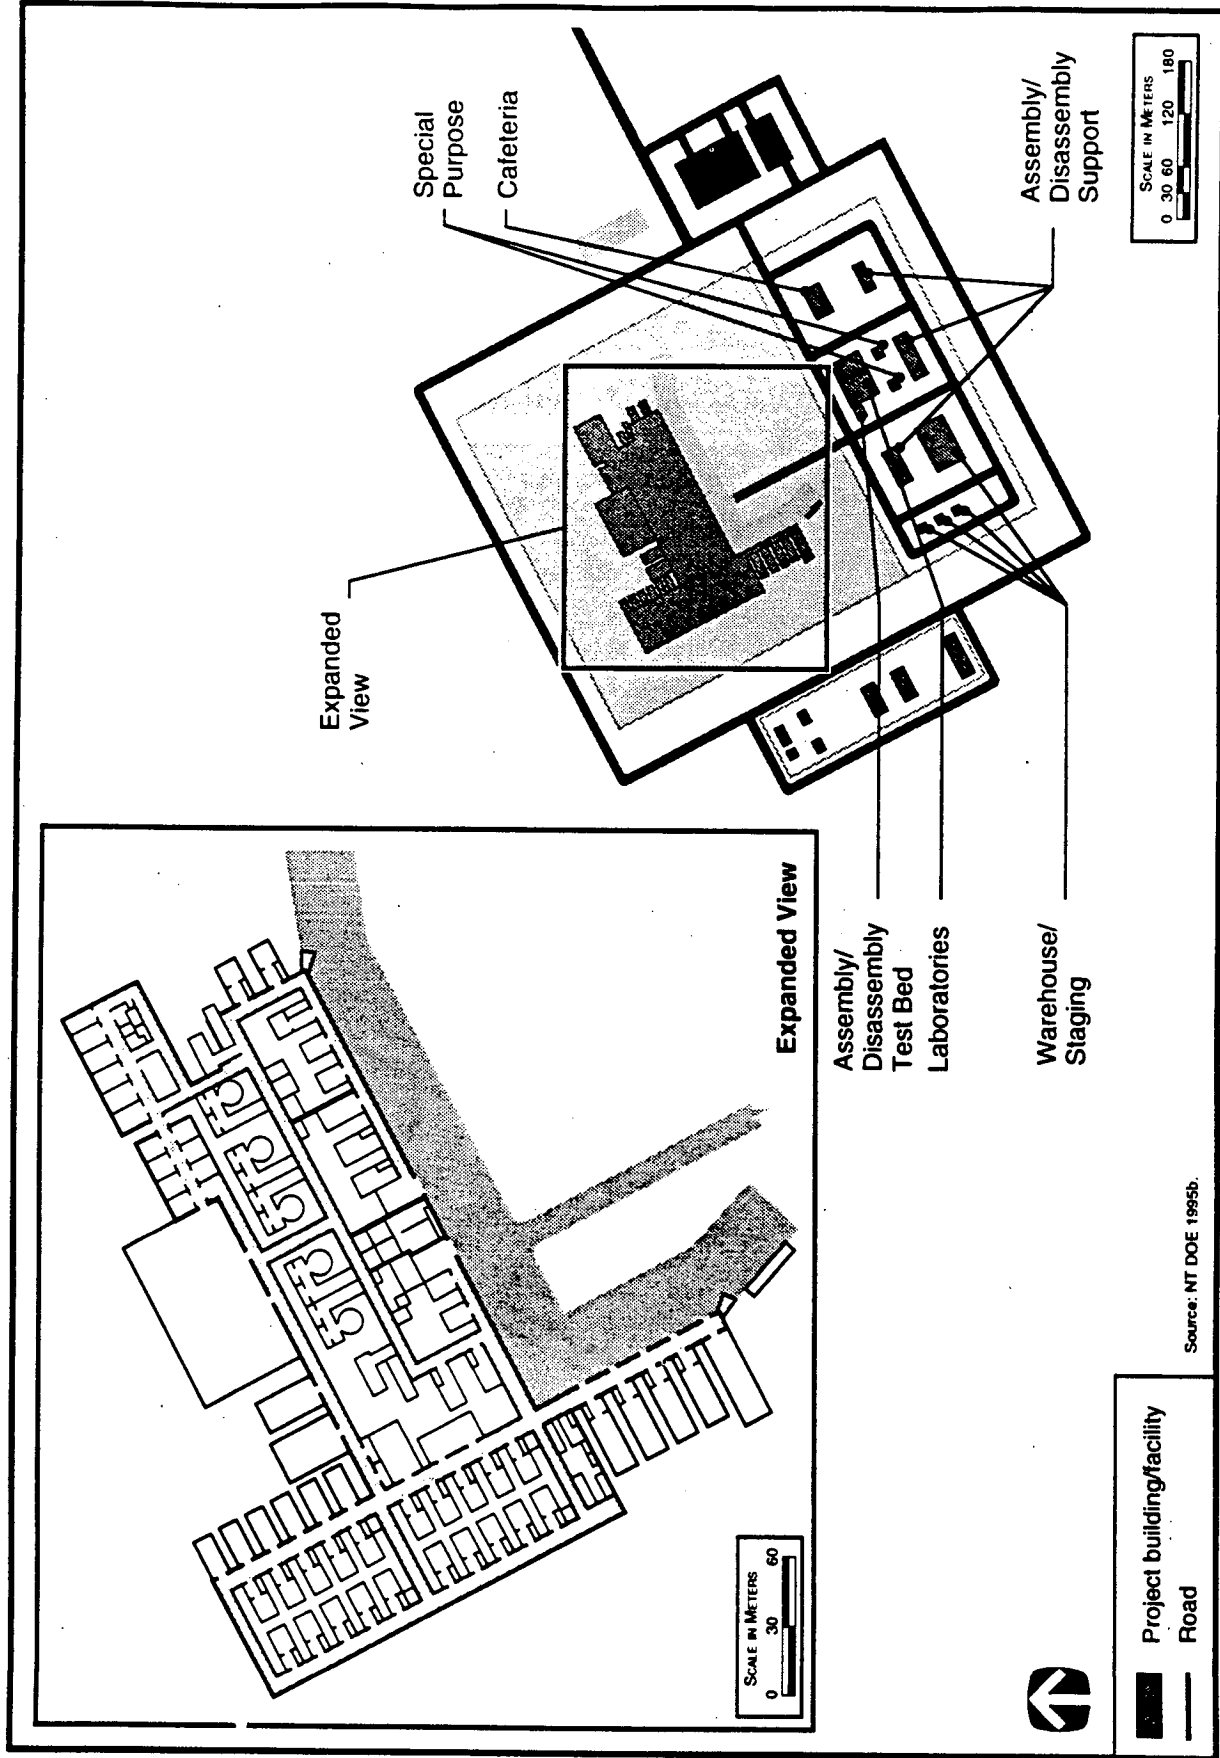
Location of Facilities at Nevada Test Site.
